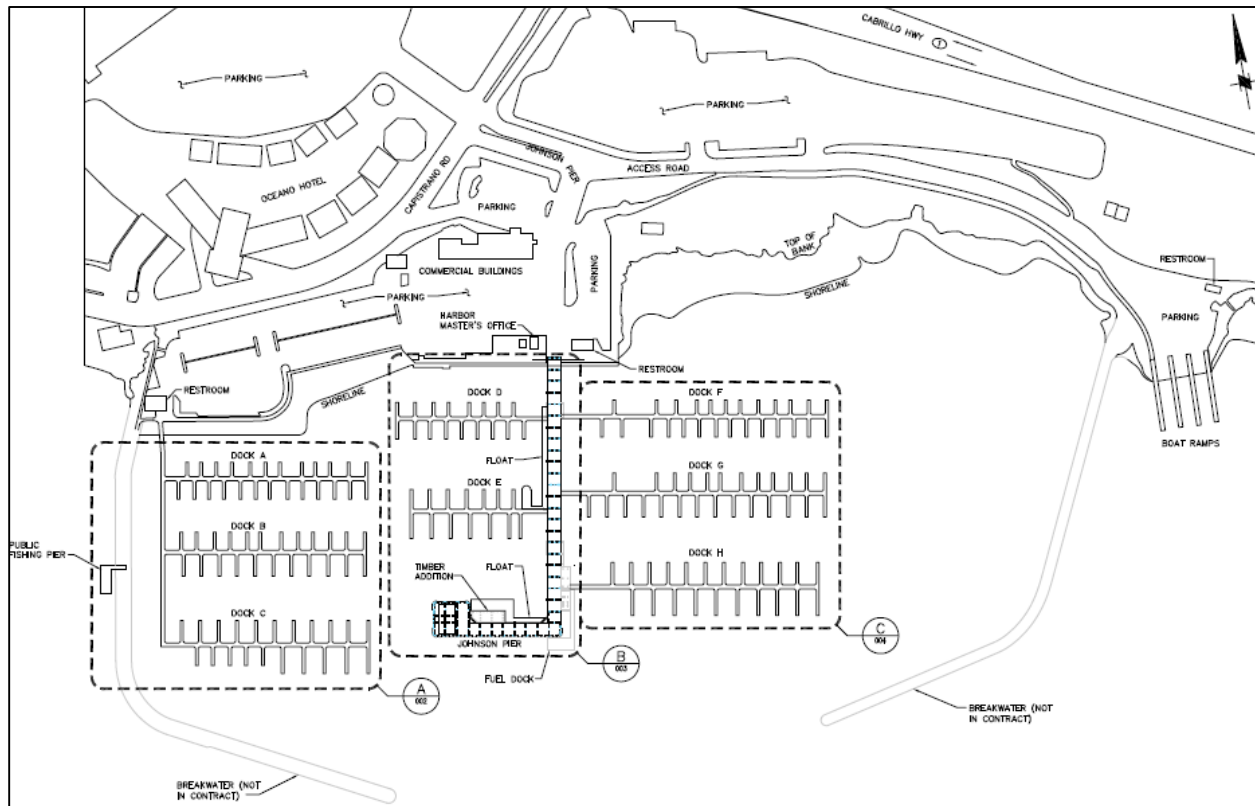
Pillar Point Site Plan (See larger version in Attachments)
